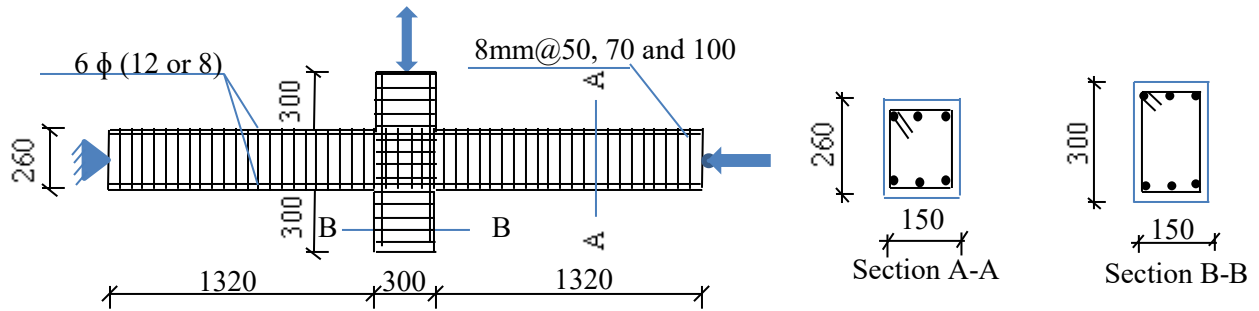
Slender concrete columns details. (Caballero et al. 2012)
